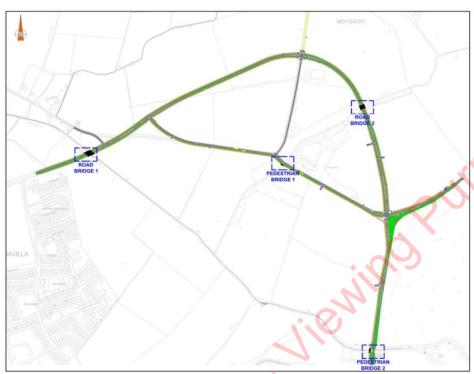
MOOR Construction Phasing (Source OCSC)
